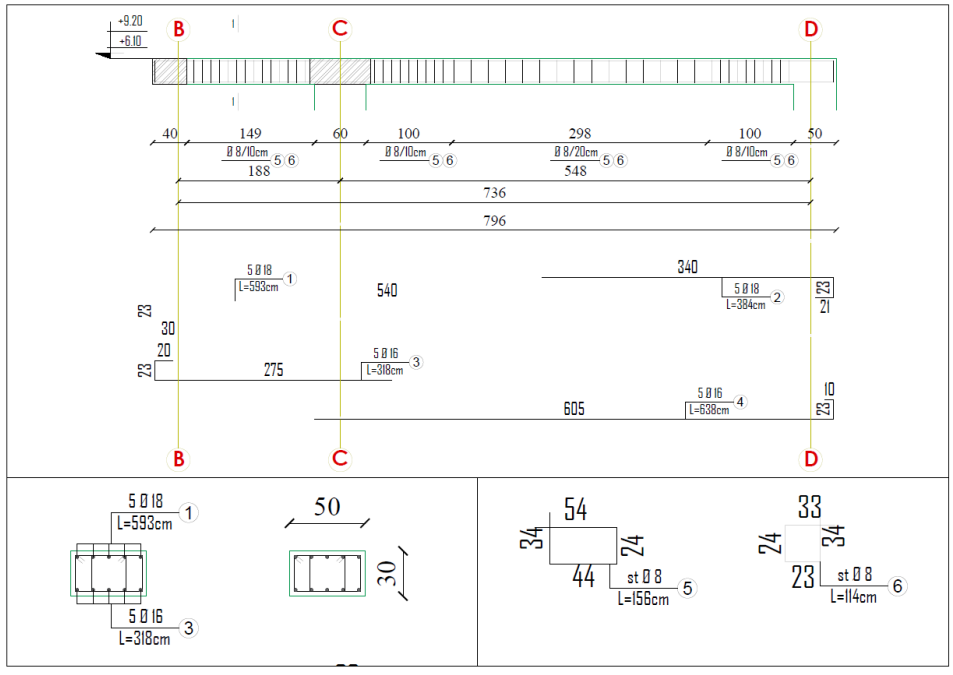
Beam T1, T3, T4 & T6 reinforcement
